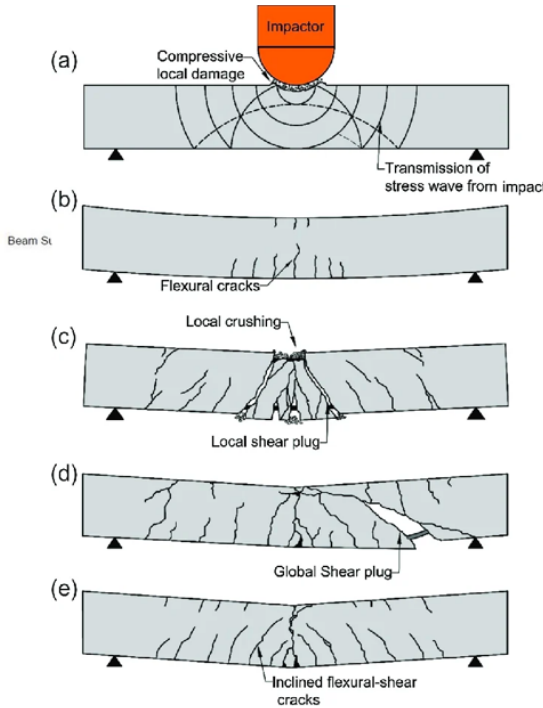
Failure Mechanisms in RC Beams under Impact and Blast Loading [Islam et al. \(2025\)](#)
